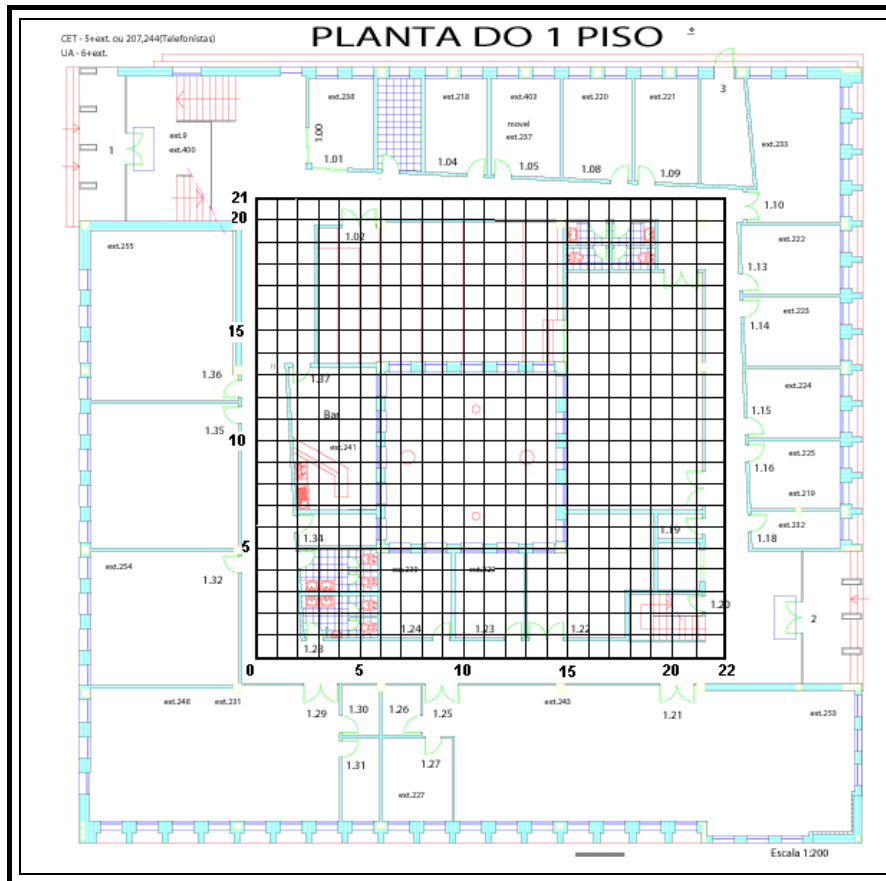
Example of a grid applied to the floor plan of *Instituto de Telecomunicações* first floor
